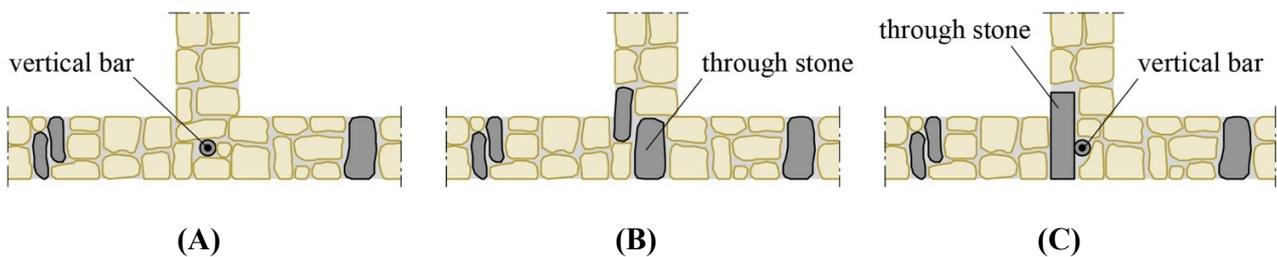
Principles of masonry details with (A) vertical steel bar in T-section and (B) through stone in T-section (both following [Arya et al, 2014](#)). (C) vertical steel bar and through stone in T-section (following [BMTPC, 2000](#)). (all by courtesy of Smart Shelter Foundation).
